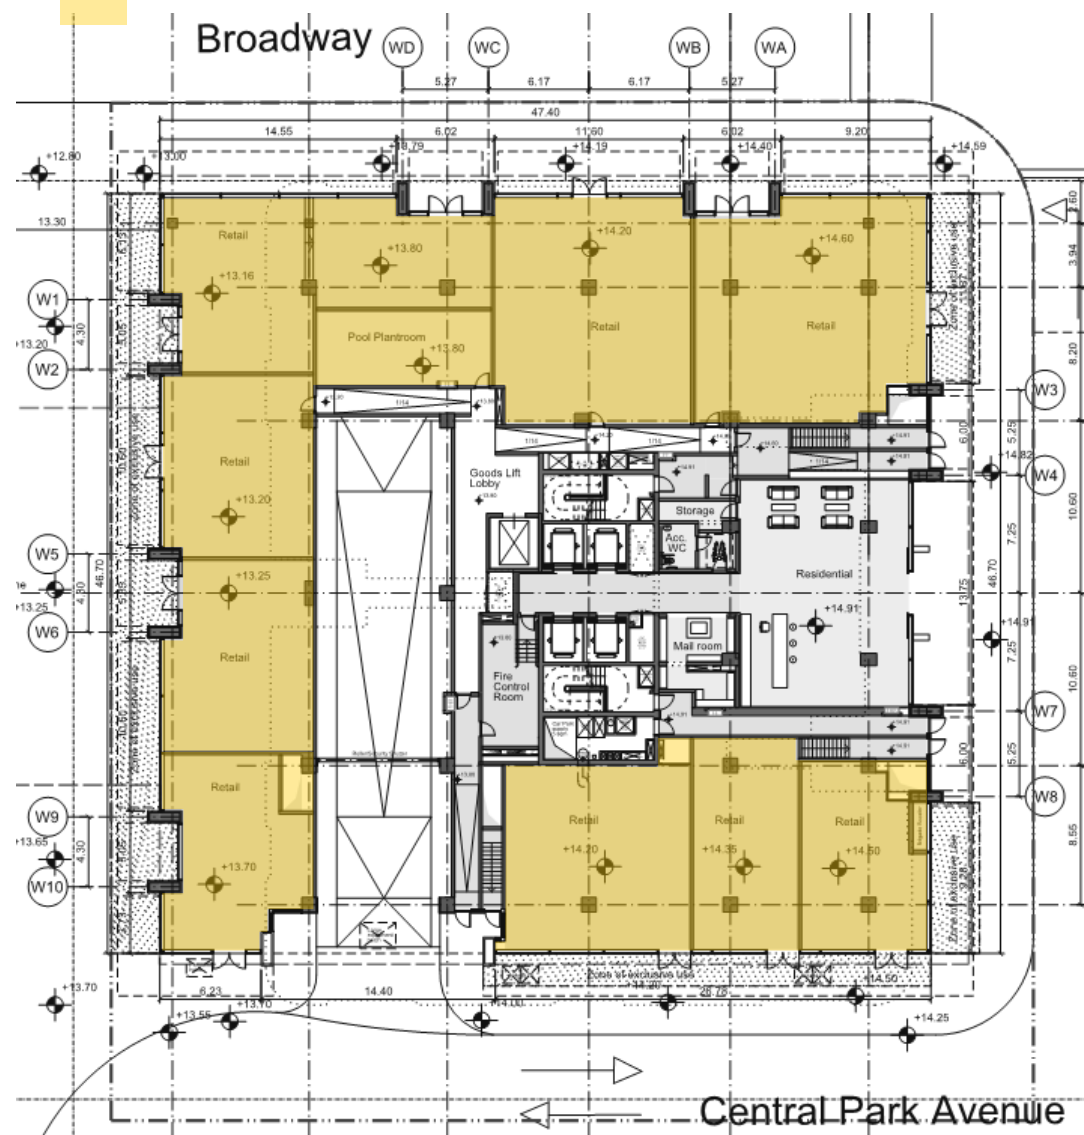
Building elements on Ground Floor assessed for the Section J, Part J1 DTS provisions review
